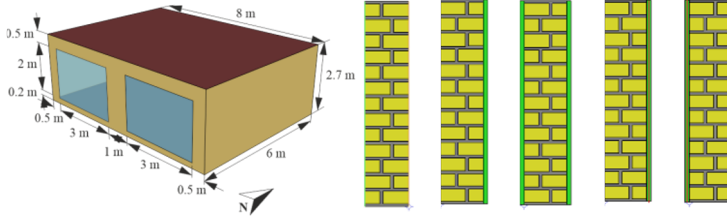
Geometry of the buildings BESTEST 900 (left), and 4 layouts of their external walls (right).
